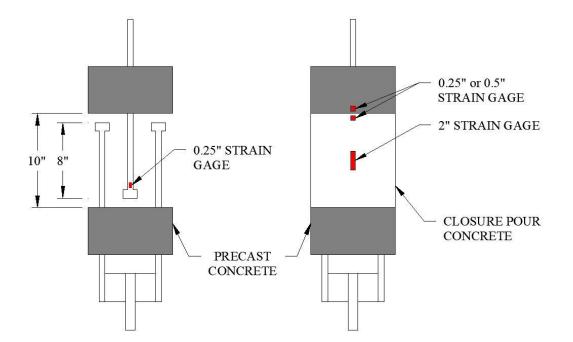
Instrumentation for Headed Bar Pullout Specimens
